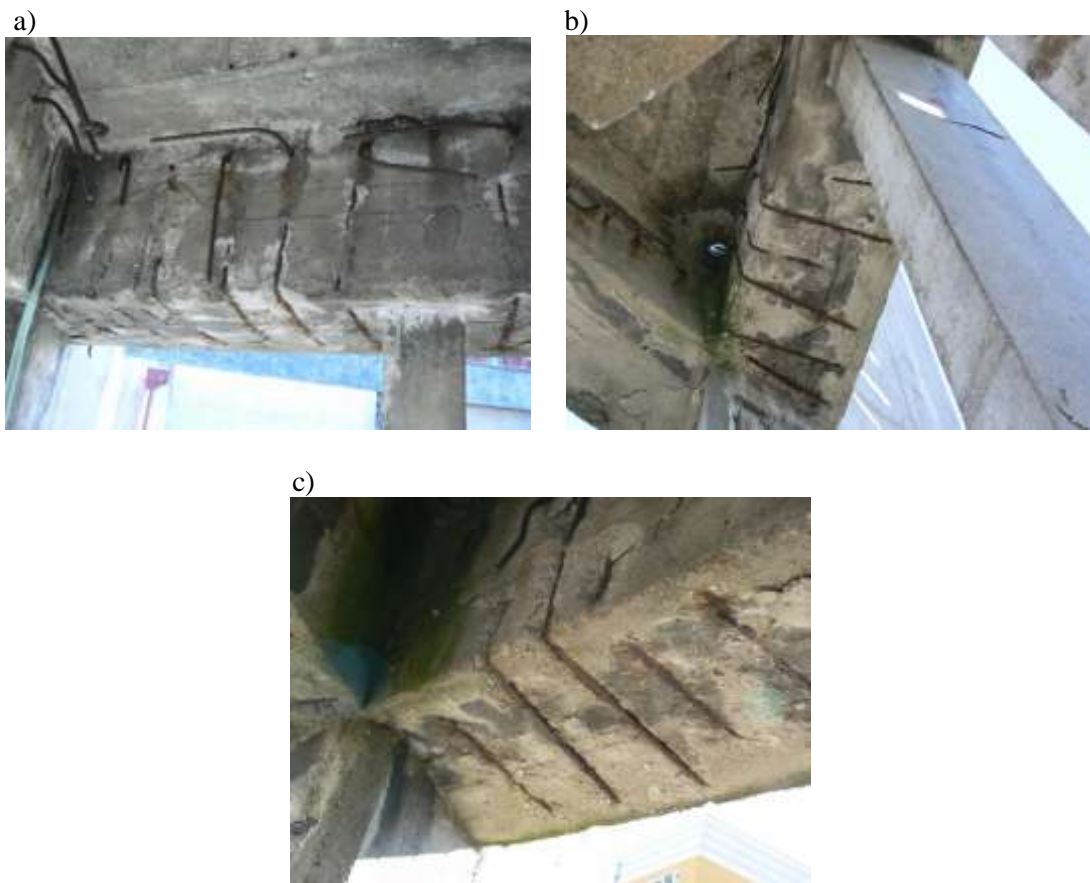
Examples of damage to the monolithic reinforced concrete bolts of the belfry tower: a), b), c) losses of the concrete cover and corrosion of the reinforcement bars (photo by Maciej Niedostatkiewicz)
